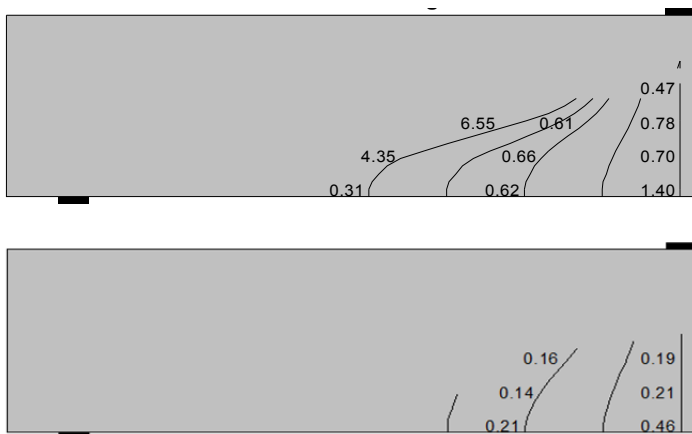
Cracking pattern at failure predicted by Response 2000 for beams AV-1 and AV-2
